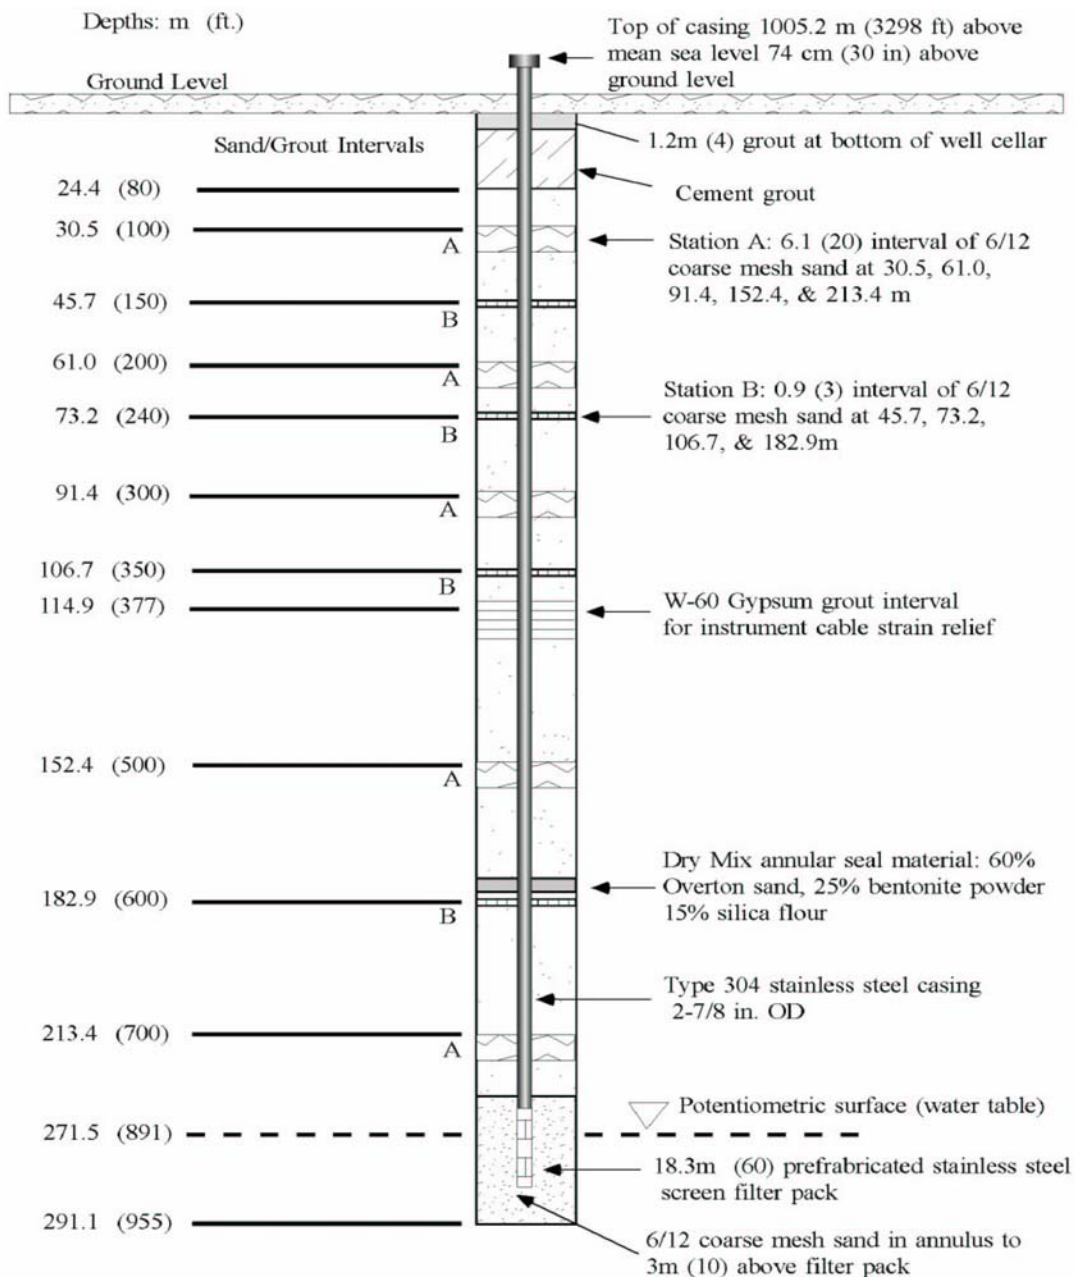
Completion Detail for Ue5PW-3 (Note: Well Screened in Timber Mountain Tuff)
